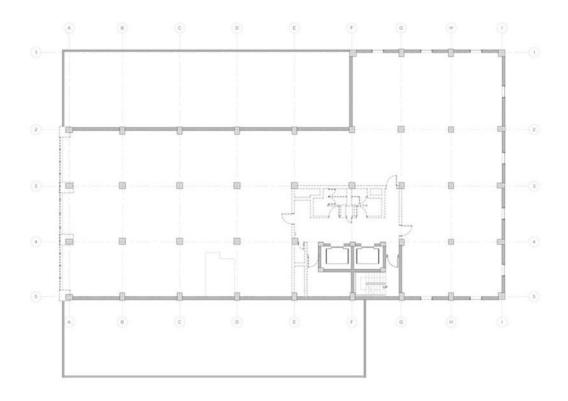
Floors 2-10 Demolition Plan of 1524, 1522, 1520 K St. N.W. D.C. Source: Eric Gellman
